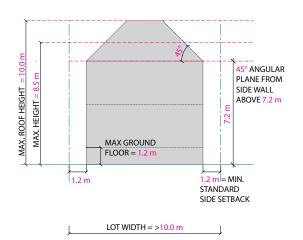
SIDE ELEVATION NO FRONT PORCH
